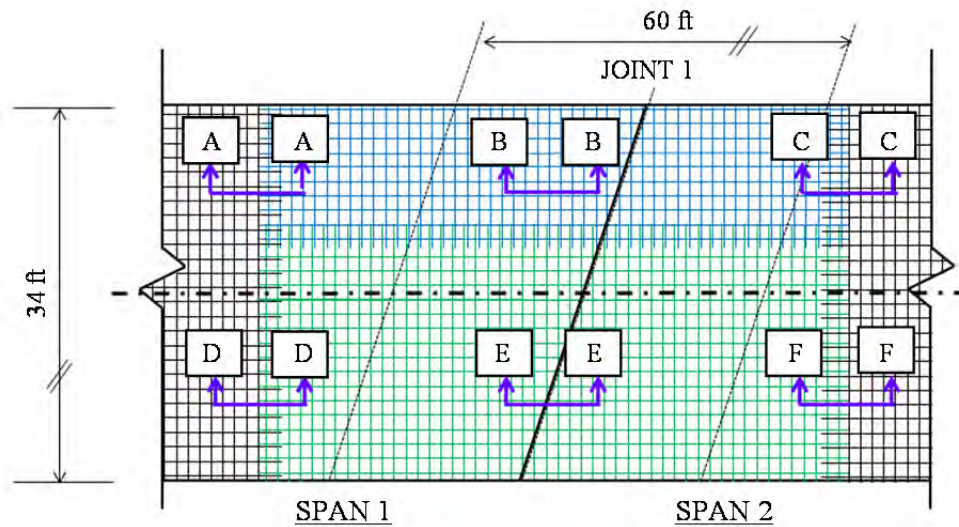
Details of longitudinal splices, Lampasas River Bridge (Span 1 and Span 2)
